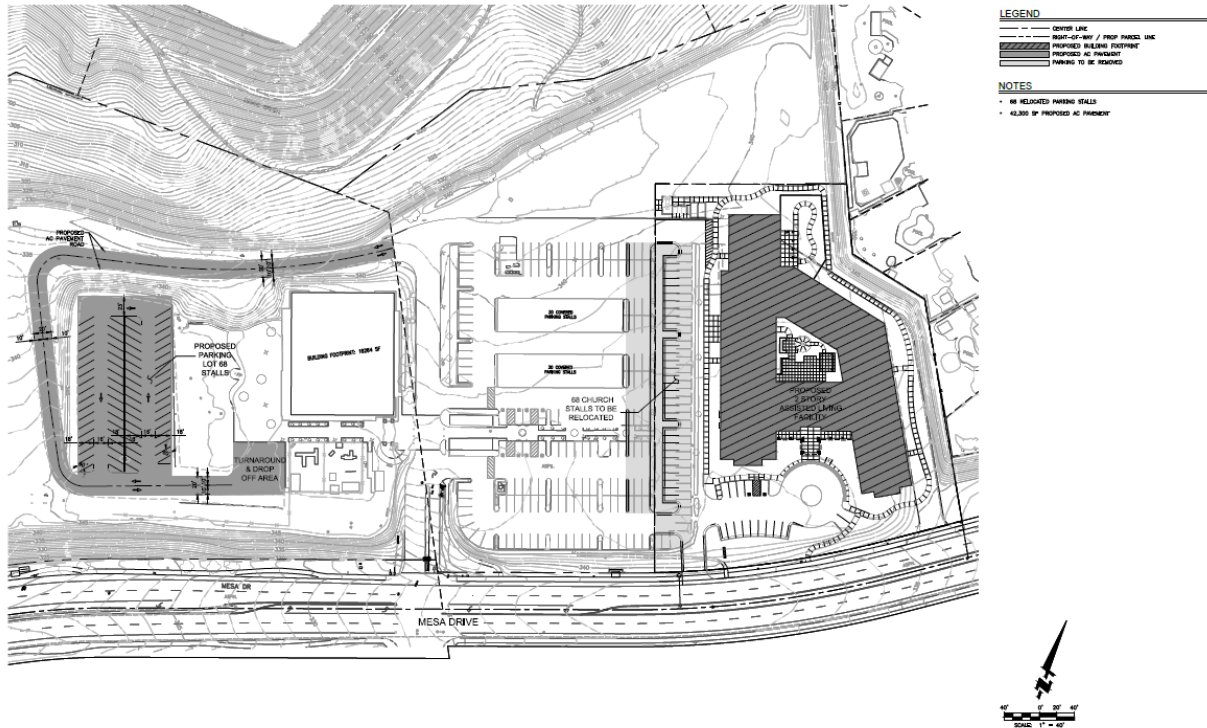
Proposed Site Plan. Areas of proposed impacted are shaded.
